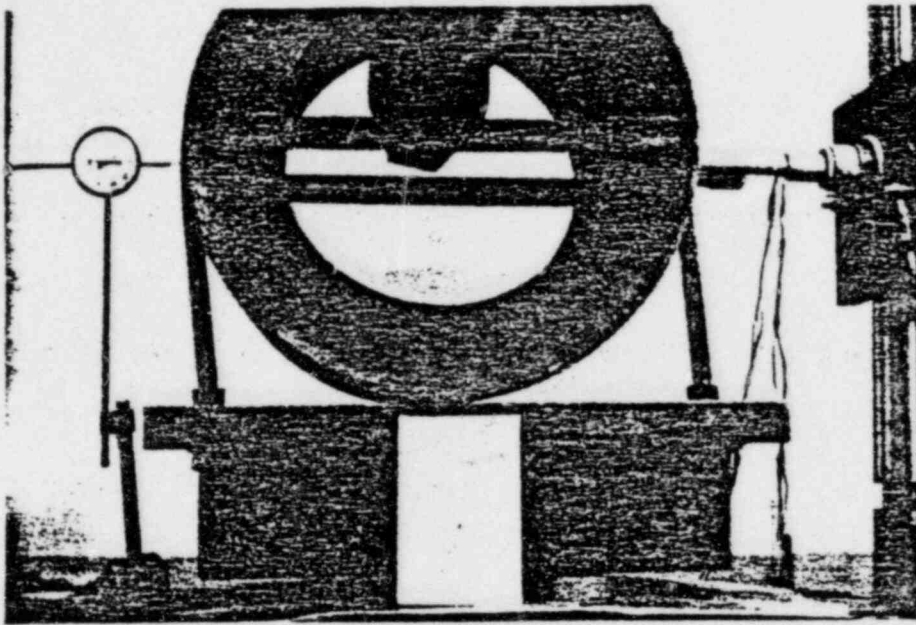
Side Load on 24" Pipe U-Bolt General Deflected Shape
